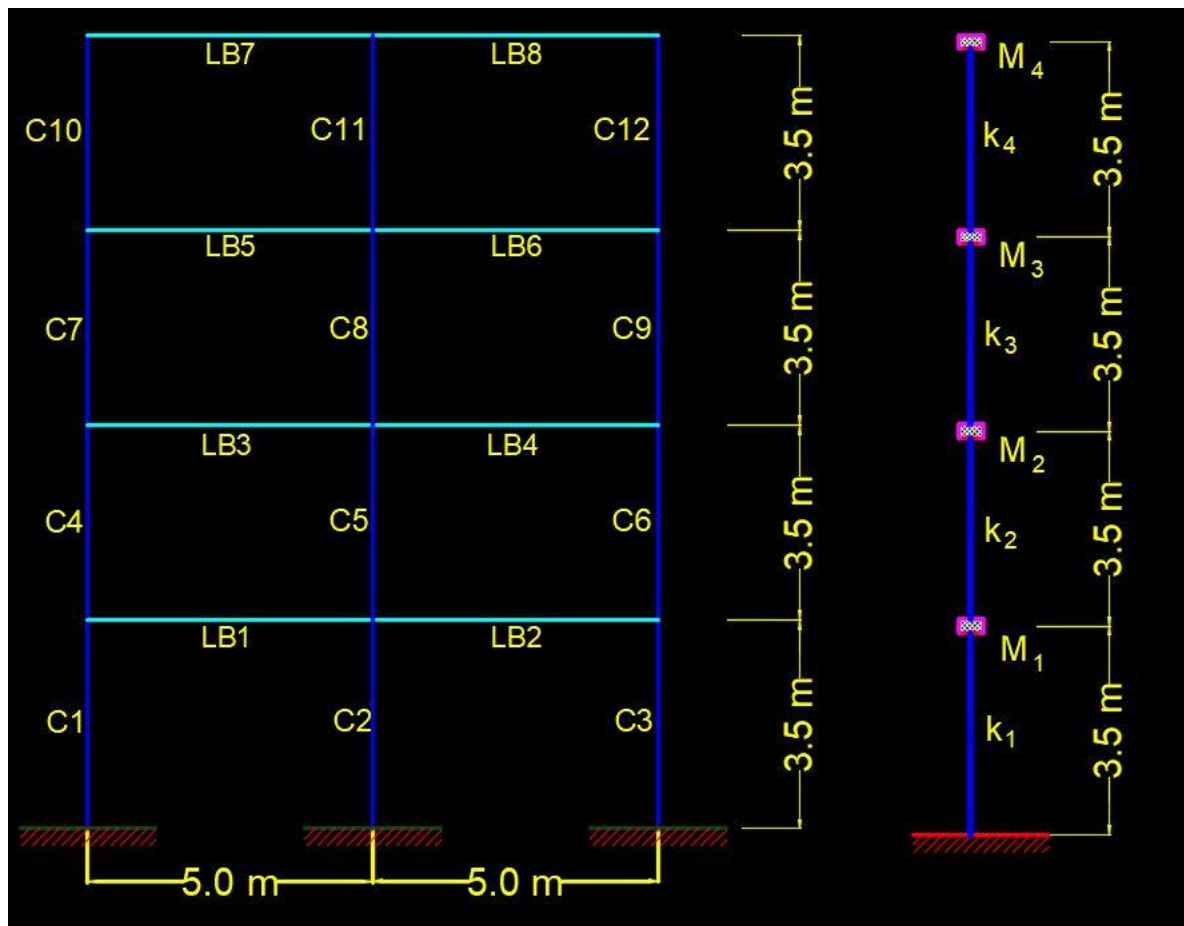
Plane Frame Structure and Its Lumped Mass Model
